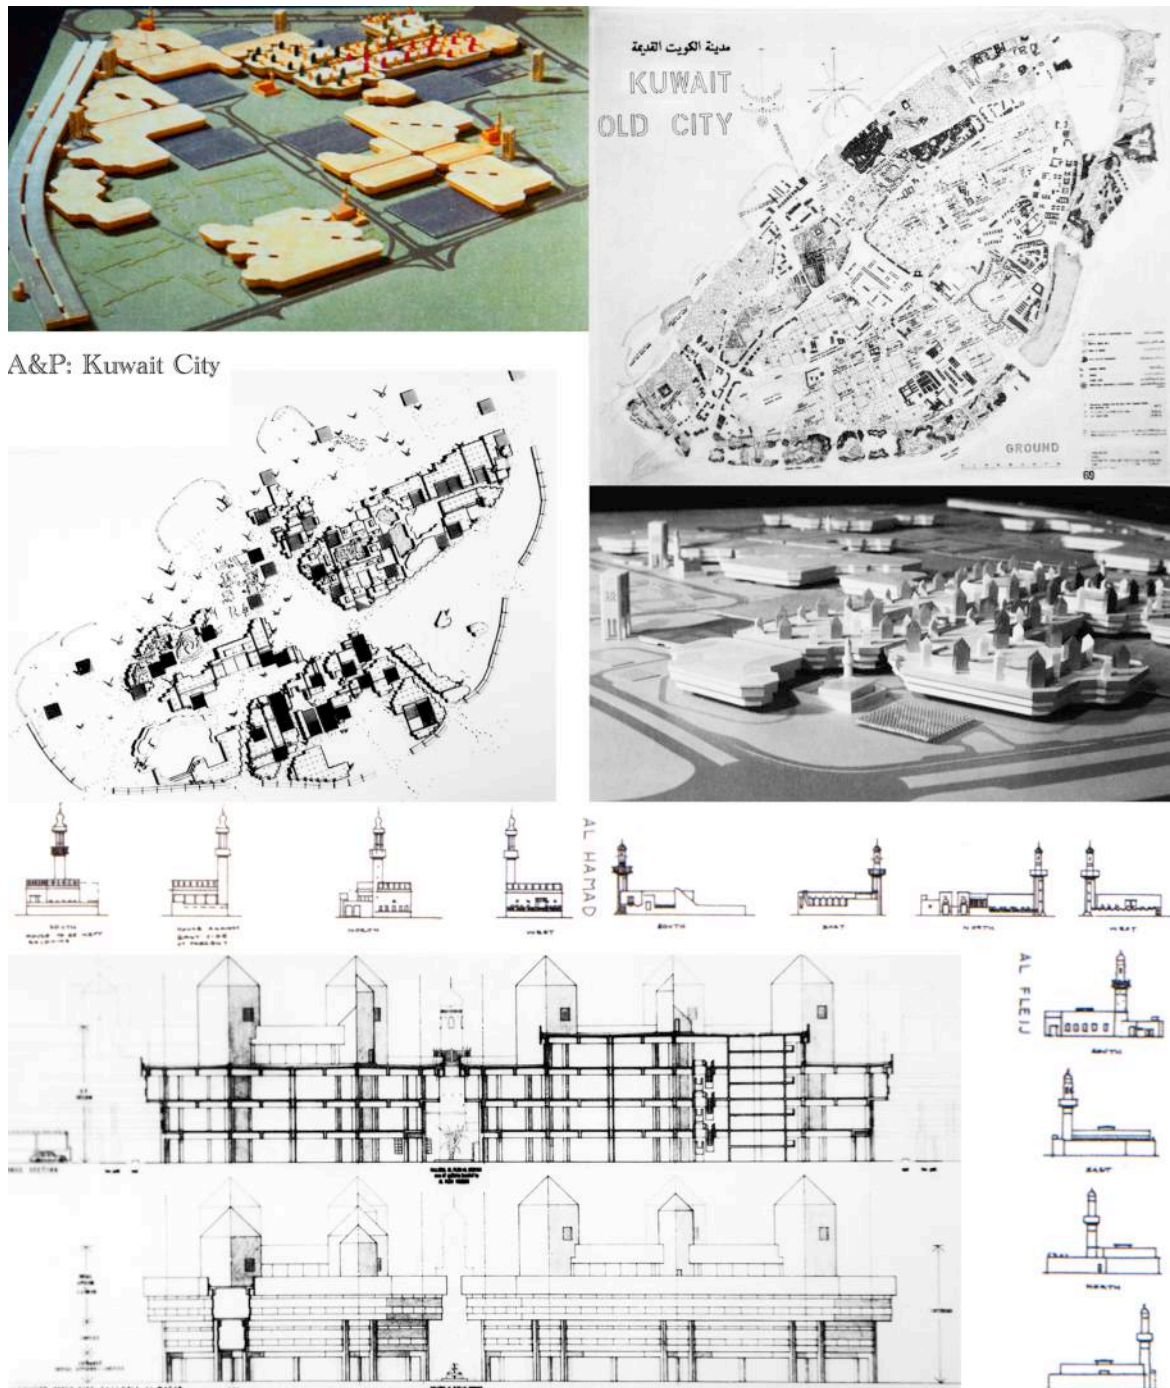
General Plan, Model, Section and Detail of Kuwait City Competition
